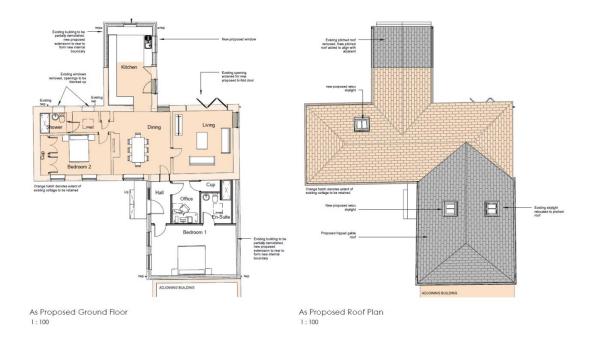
Proposed ground floor and roof plans of The Cottage.
